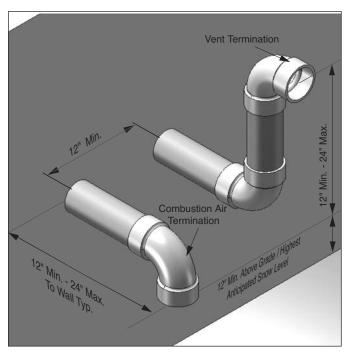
Direct Vent - Sidewall Termination of Vent and Combustion Air Piping
